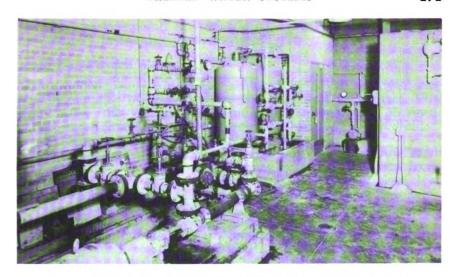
Interior view of pressure filter water-treatment plant prior to improvements—Apalachia.
